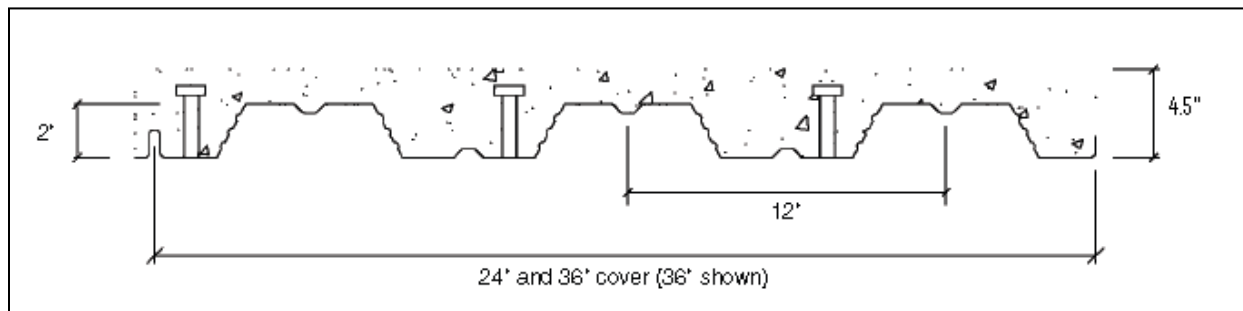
2" LOK-FLOOR Decking with 4.5" Concrete Slab
